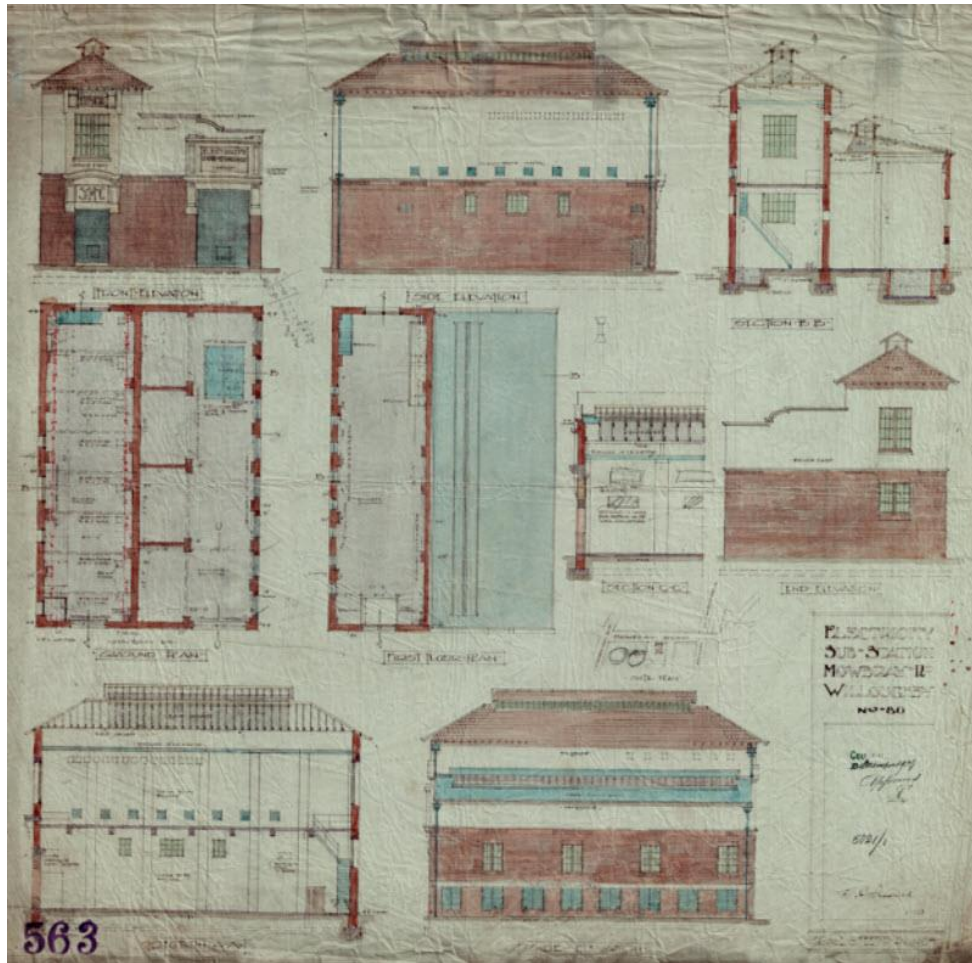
Architectural plans of the Substation No.80 on Mowbray Road, c.1923
